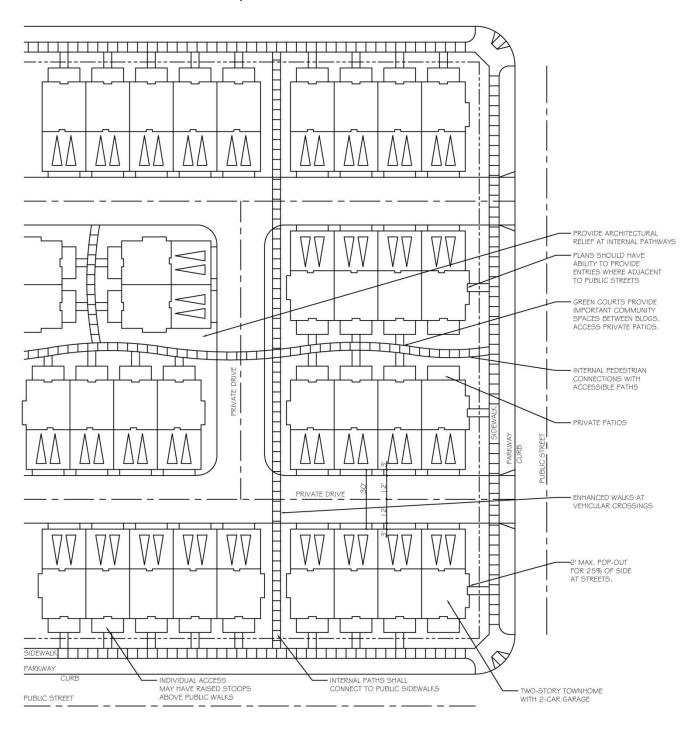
Typical Multi-Family Plotting "Two-Story Townhome"
